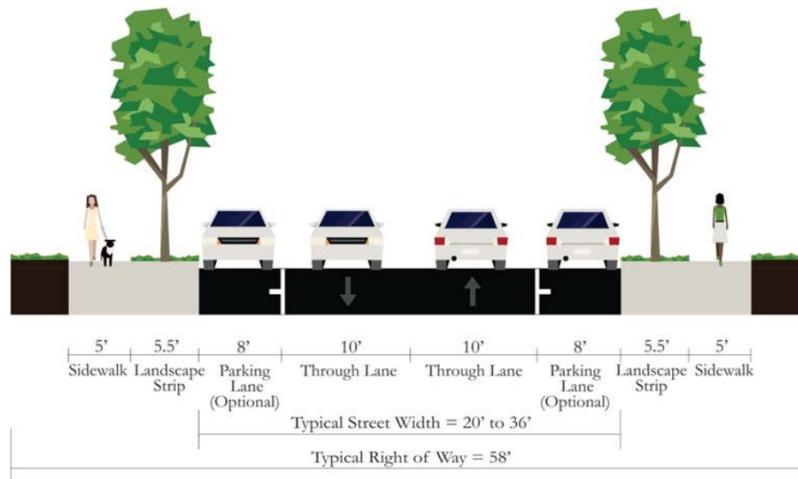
of the TSP illustrates a standard cross-section for a local street in the City of Lebanon. As stated under the Typical Roadway Cross-Section Standards heading of the TSP, the provided cross-sections “are intended to be used as guidelines in the development of new roadways and the upgrade of existing roadways. Planning level right-of-way needs can be determined using these
